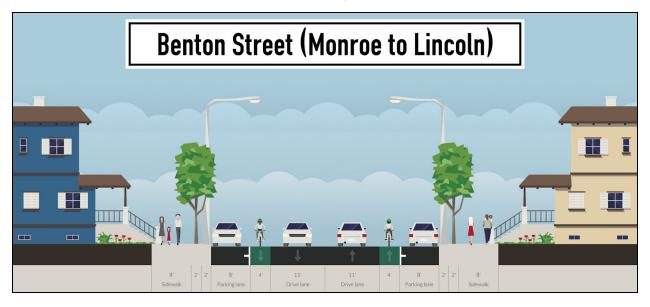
Cross-section of Final Design for Benton Street (Monroe to Lincoln)
